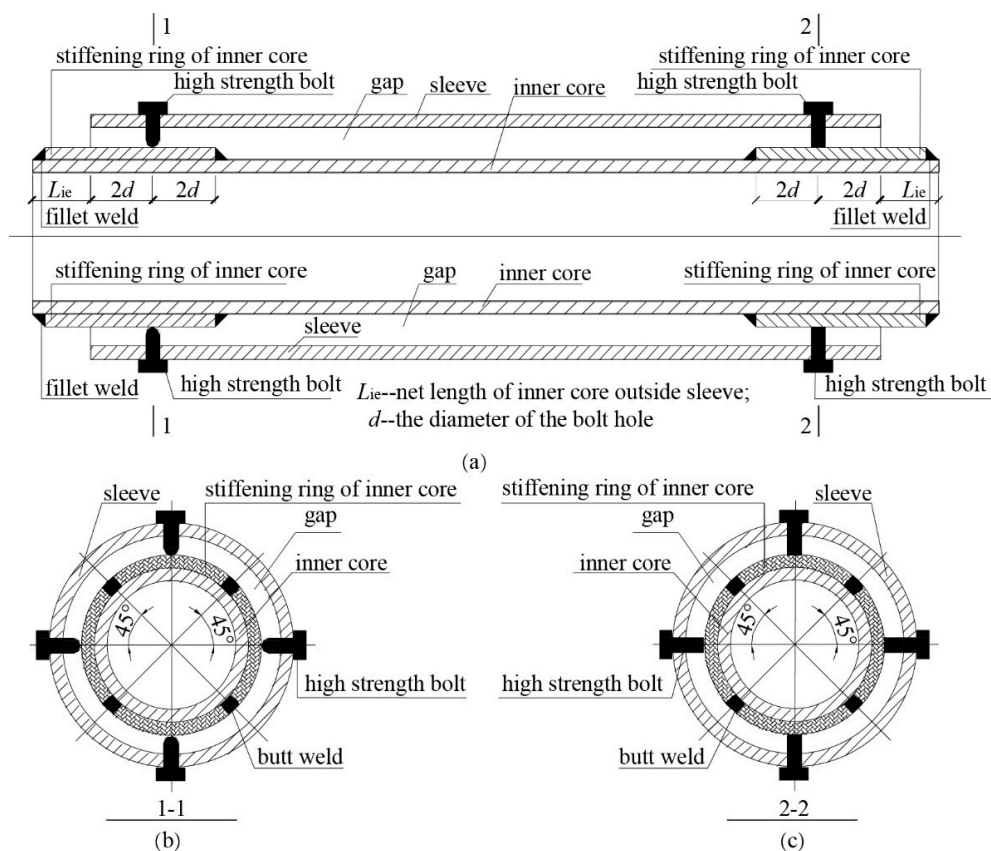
Connection details between the inner core and the sleeve: (a) Profile of sleeve structure; (b) Sliding hinge support; (c) Fixed hinge support.
